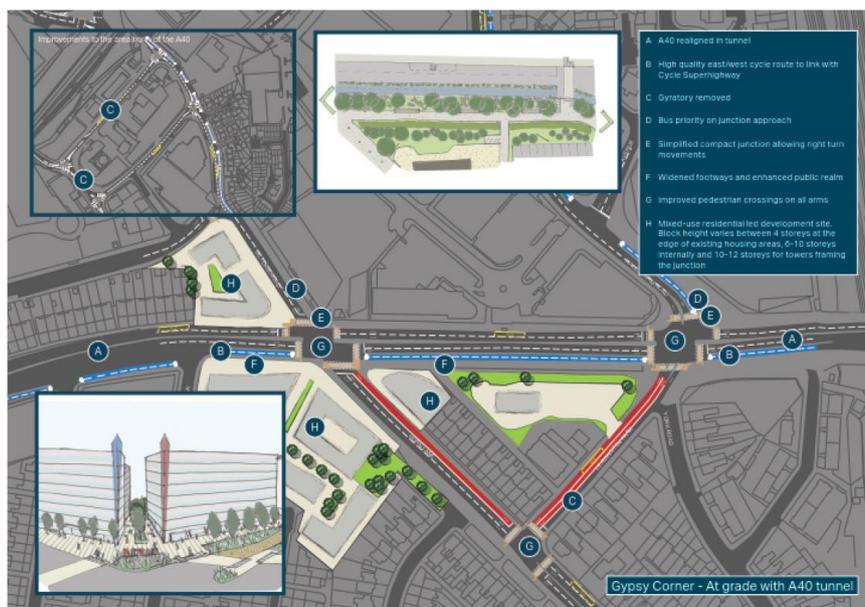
Gypsy Corner Surface Junction Layout (Options 1 and 4)
